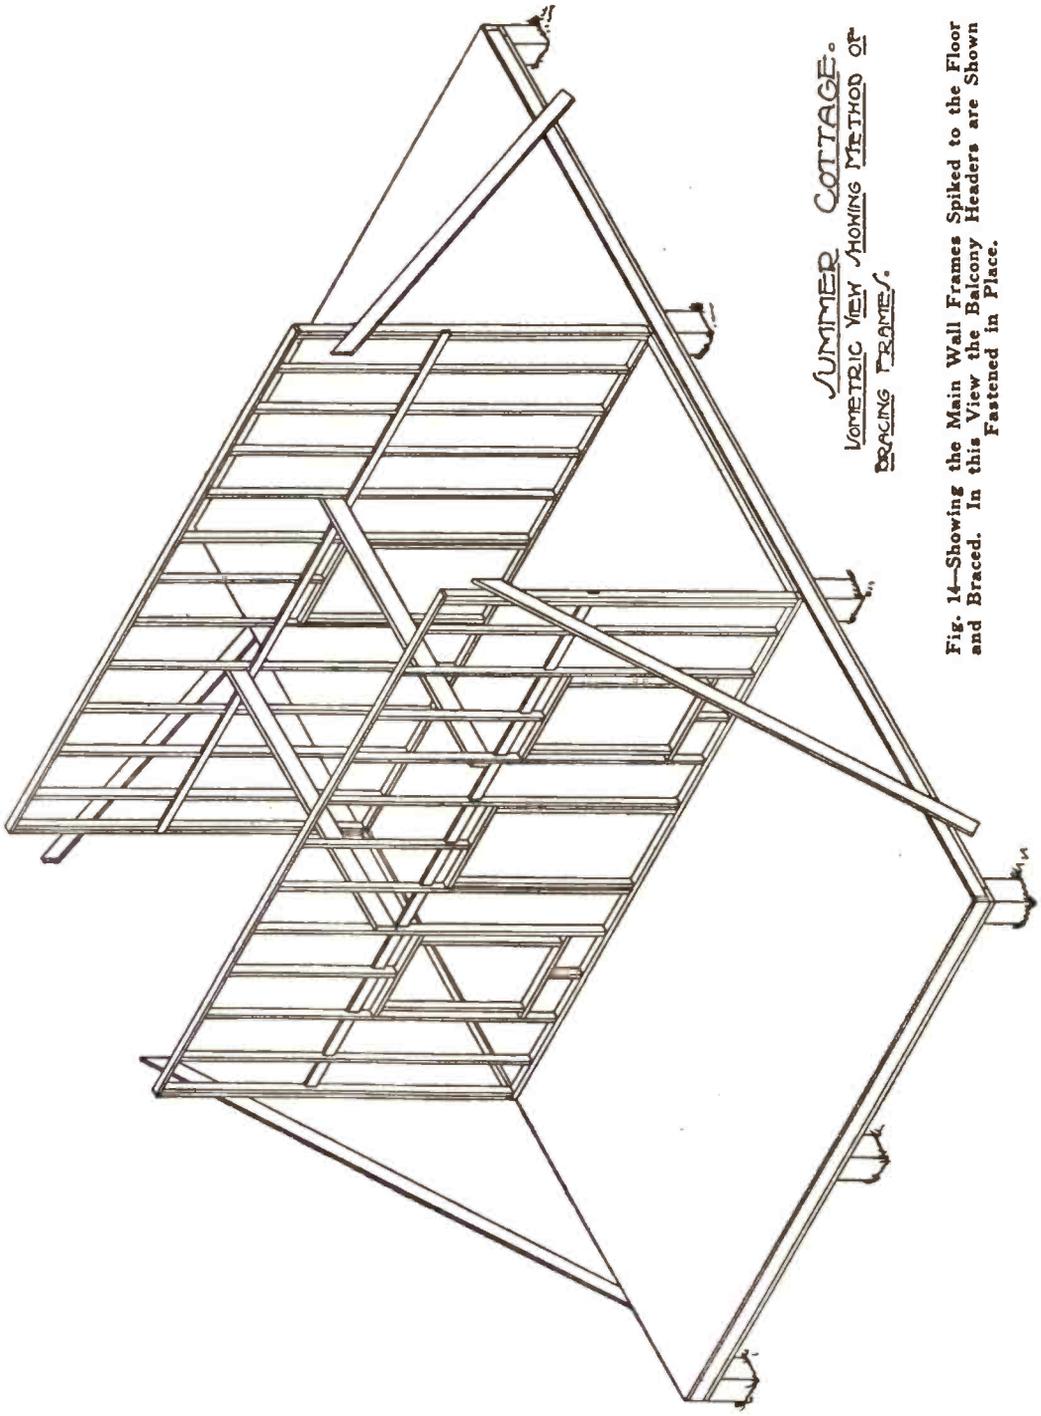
Showing the Main Wall Frames Spiked to the Floor and Braced. In this View the Balcony Headers are Shown Fastened in Place.
